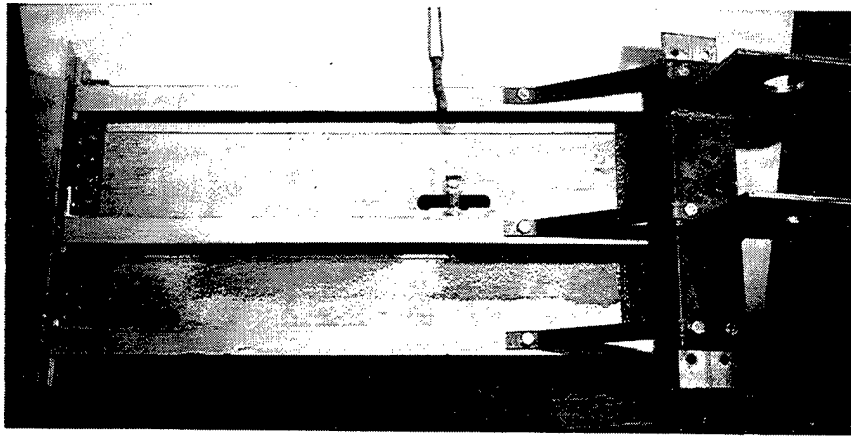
Underside view of the test section in Figure 69. Three aluminum channels can be seen in a longitudinal direction with both ends riveted to the aluminum end plates. Steel straps were bolted to the test jig at right and to the channel flanges to reinforce the end plate to prevent flexing during the pull tests. Note the lifting steel bar bolted at the oblong hole in the aluminum floor plate.
